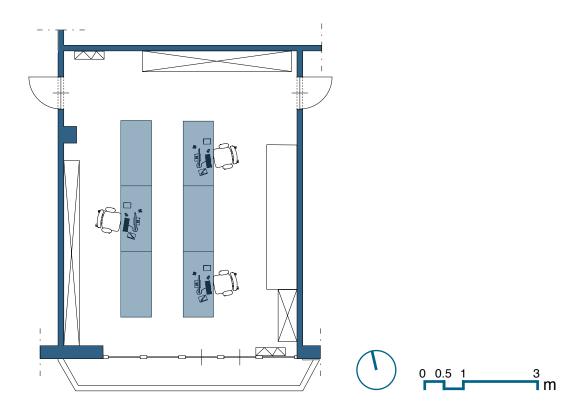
measuring plans positioned inside the room, at 0.85 m height above floor. Office plan, scale 1:100
